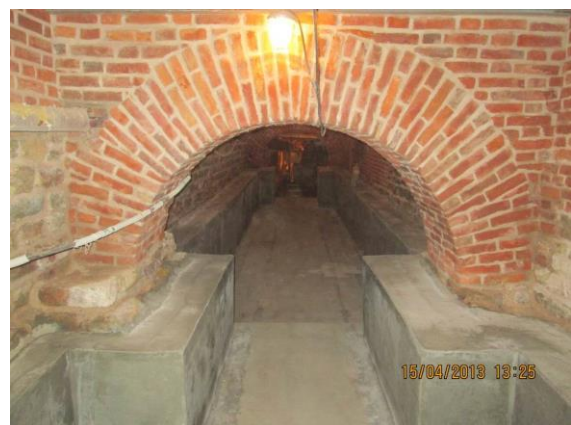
General view on the reinforced concrete caisson. Corridor of the basement of the Alexander Palace
